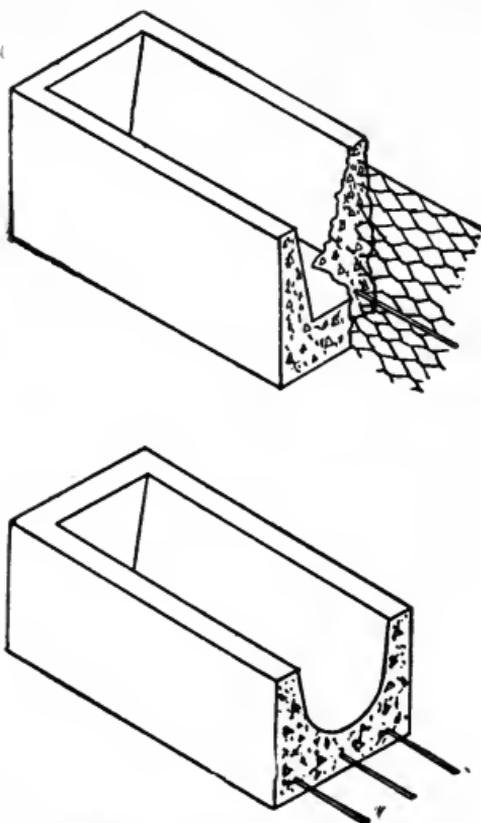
Showing Two Ways to Reinforce a Concrete Feeding Trough
